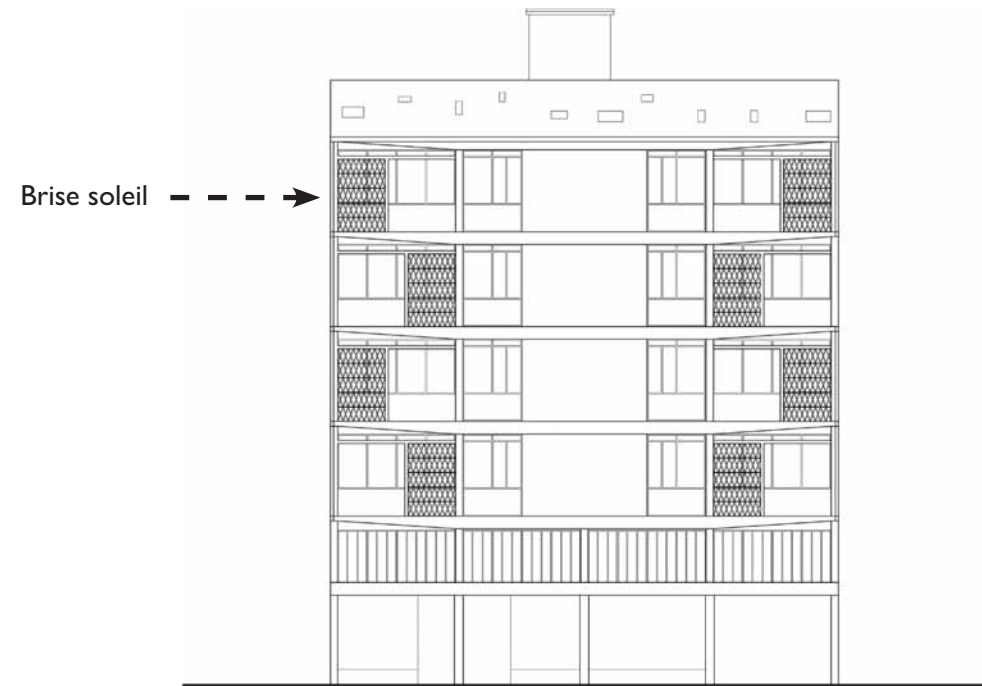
The Berrals Building - Eastern elevation (Author, 2010).
